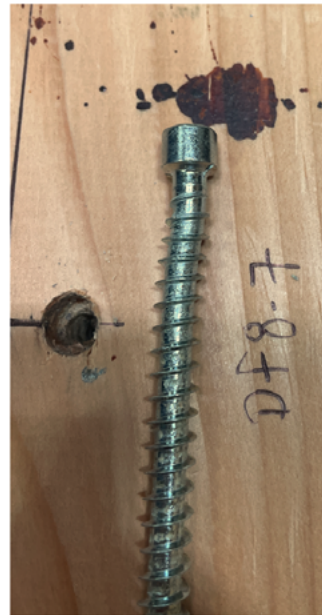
Buckled Screws in an Assembly for Bearing Reinforcement
